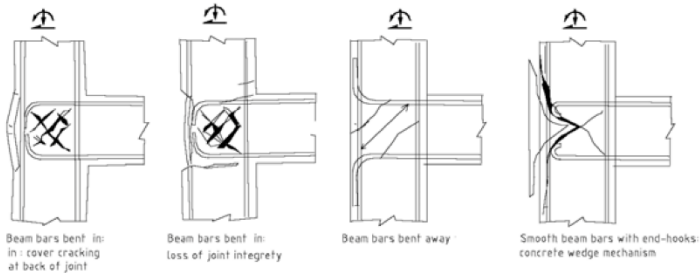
Typical anchorage details and collapse mechanisms for beam-column joints designed for gravity loads only. From [50]
